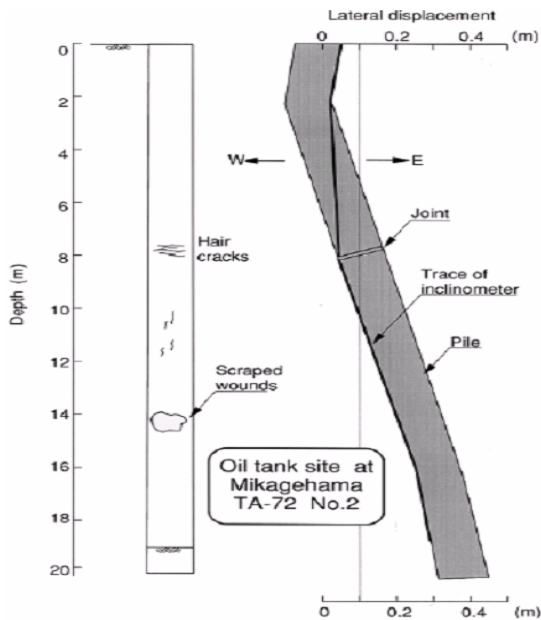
Lateral displacement and observed cracks on the inside wall of Pile No. 2 Kobe 1995 EQ (Ishihara and Cubrinovski, 2004)
